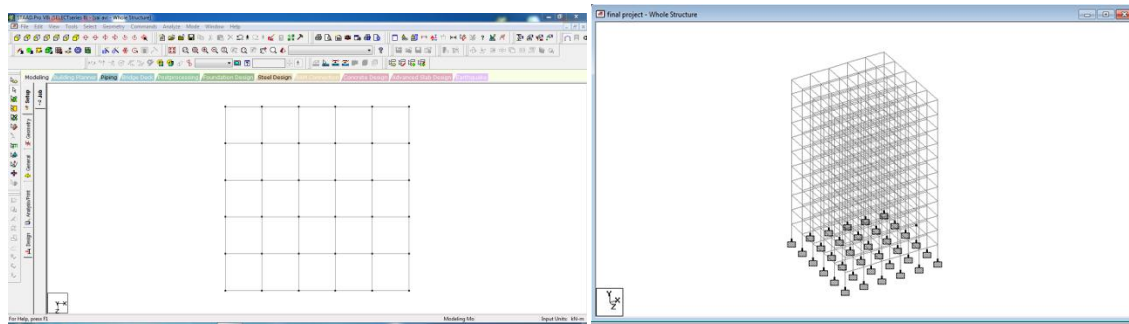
Plan of the G+10 storey building in Staas.pro and E-Tab
